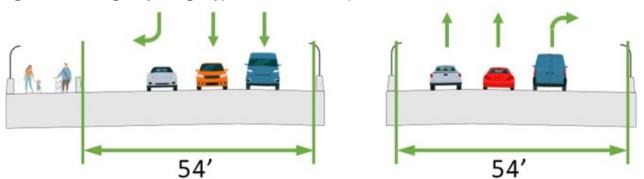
Highway Bridge Typical Section, Temporary Condition (First Bridge with all Through Traffic)
